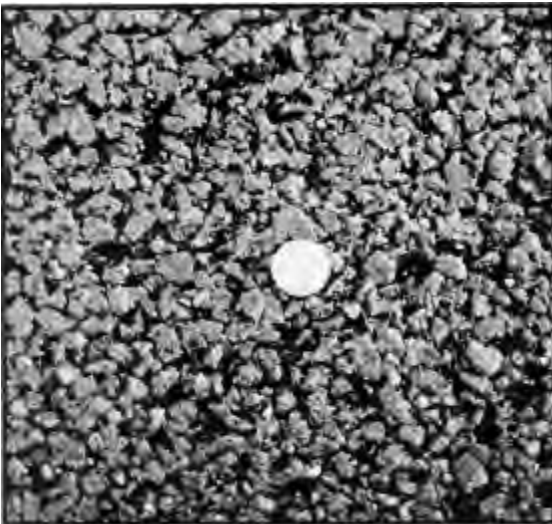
Porous friction pavement patch using hot-asphalt plant mix
